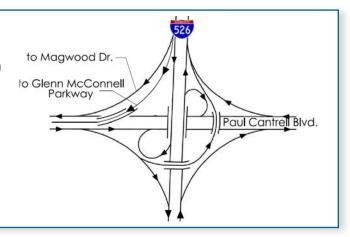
I-526 at Paul Cantrell Boulevard Alternative 2
